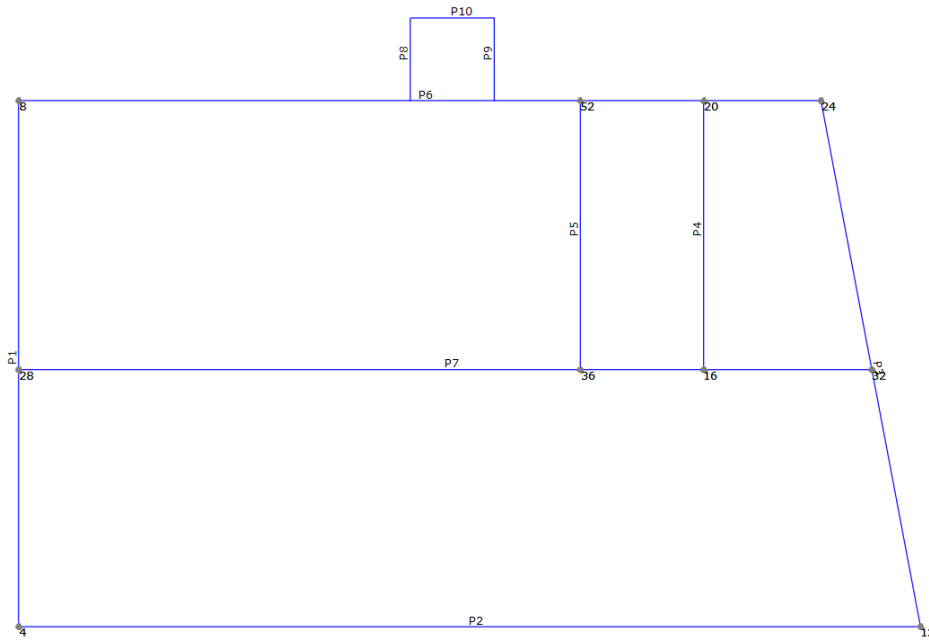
Names of the walls of the building in the model in 3Muri (plan of the second floor).
